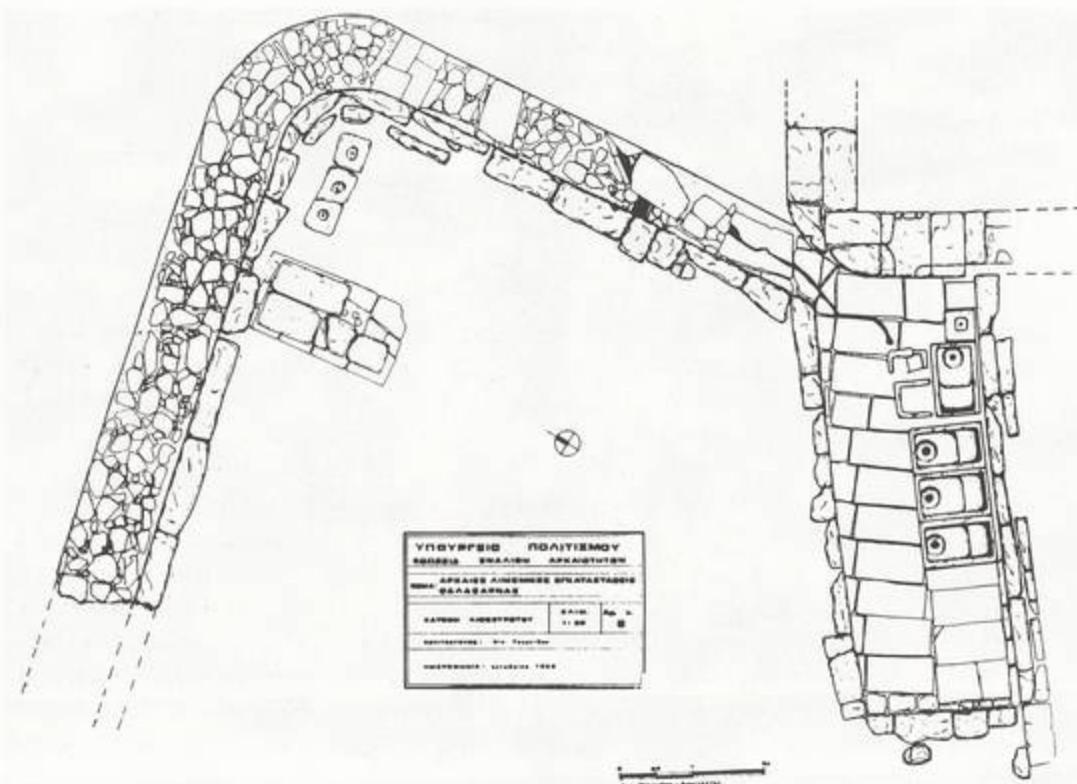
Plan of long polygonal wall with adjoining basins and paved road. Plan by K. Tagonidou
